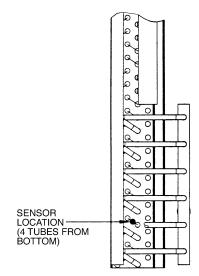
D — Motormaster III Sensor Location (48EJ,EK,EW,EY054-064)
